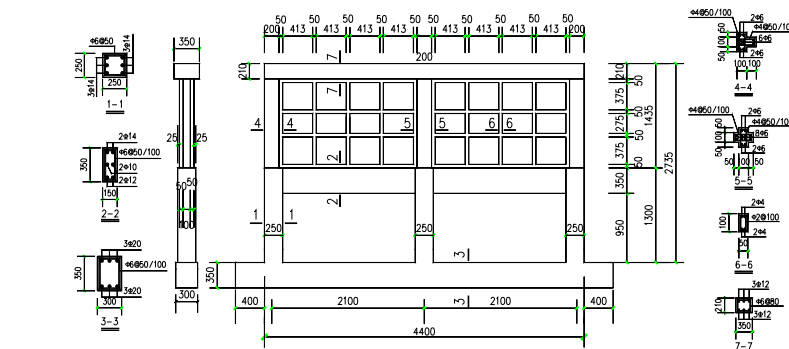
Geometry dimensions and reinforcement details of specimen KZML-1
